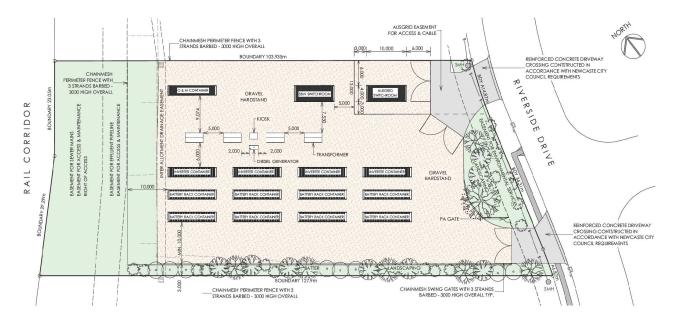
Proposed Battery Storage Facility (Source: GCA)
